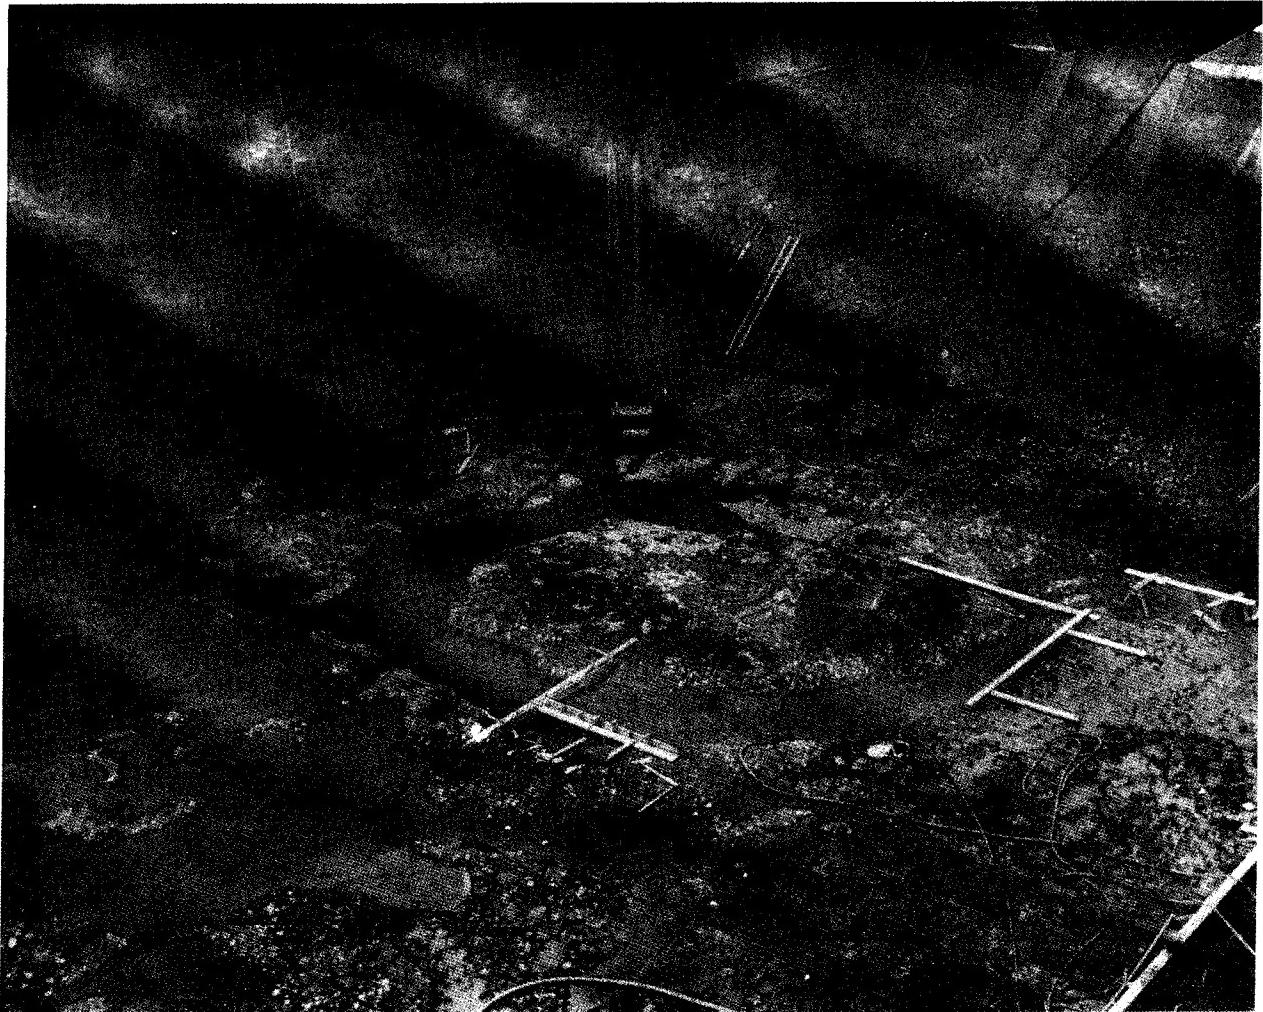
Abrasion erosion of a stilling basin slab, Kinzua Dam
